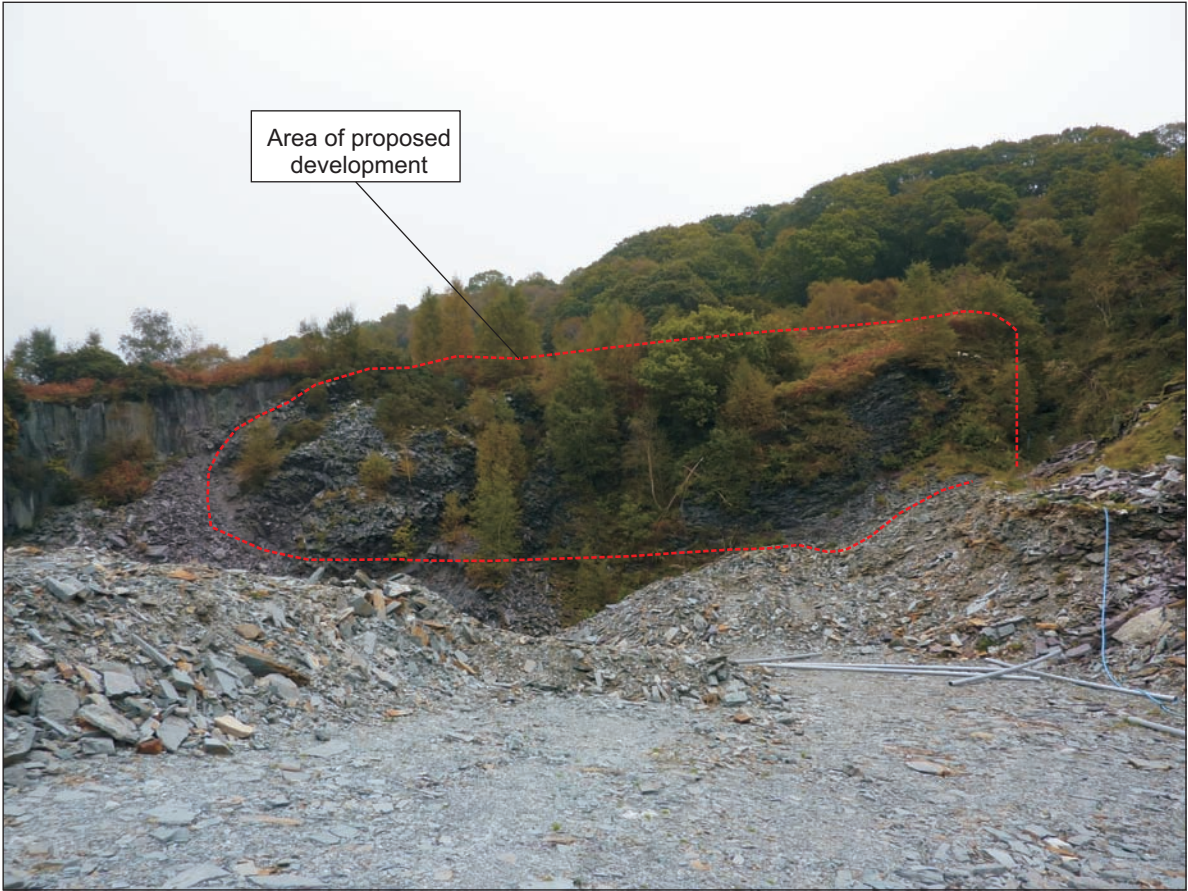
View of rockmass between the two quarry excavations, view looking south.
